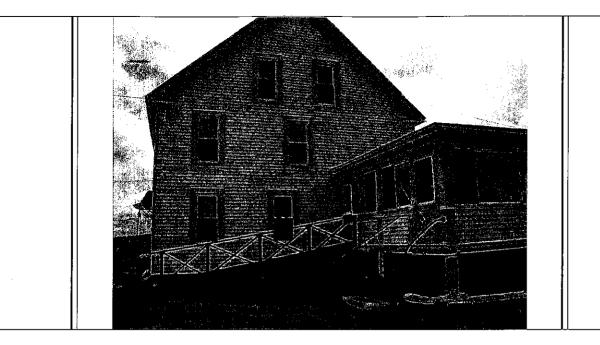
04/27/05 - Two Car Garage (Building #18): Adjacent porch bearing on garage roof
